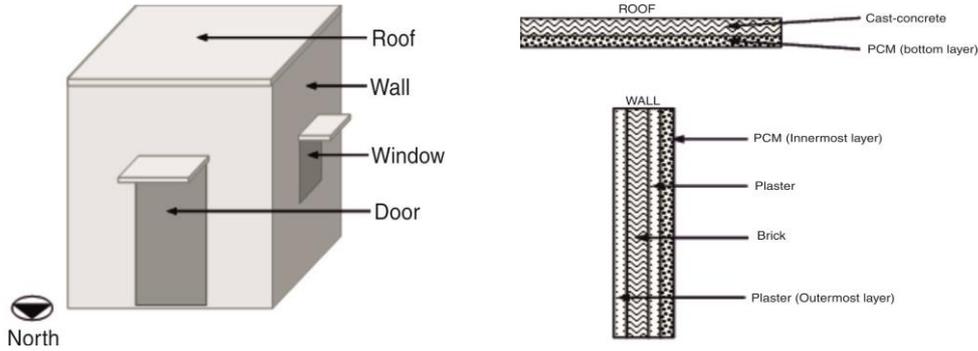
Schematic view of the modelled building; (a) building model and (b) layers in walls and roof
